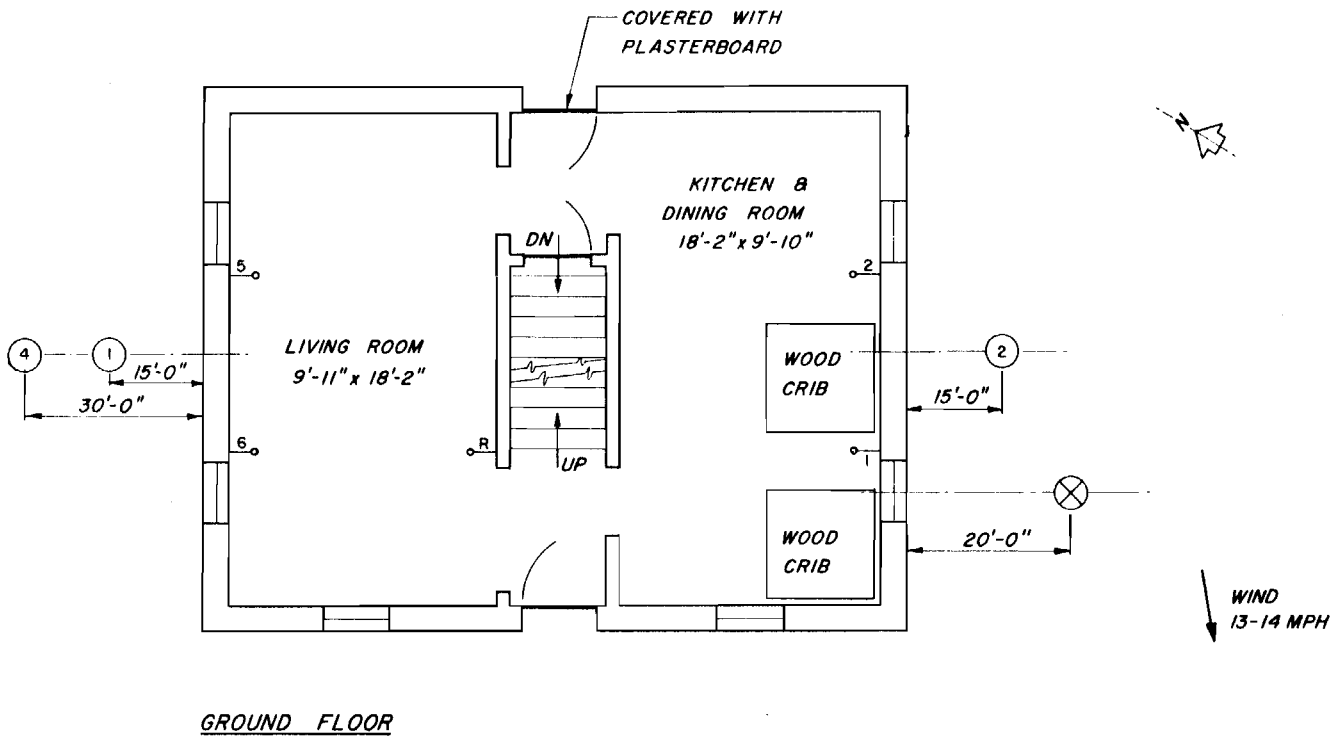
BUILDING No. 2 - TWO-STOREY SOLID BRICK DWELLING
